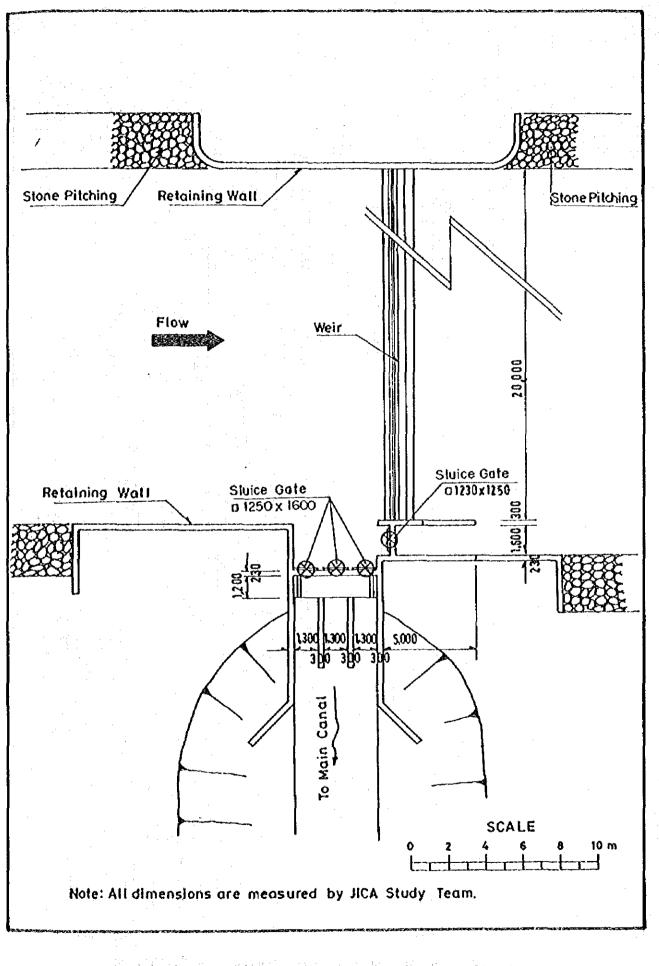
PLAN OF NYAMINDI HEADWORKS
